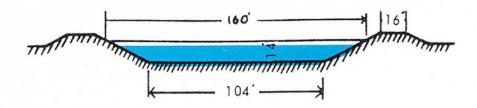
Earthen Embankment Canal Section: Erie Canal – Waterford to Three Rivers
